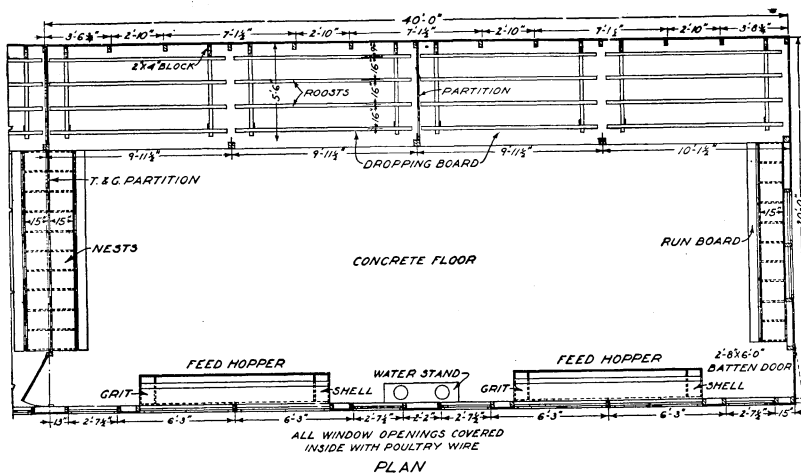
Plan of the shed-roof laying house shown in figure 16. Each pen is 20 feet deep by 40 feet wide, and has a capacity for from 200 to 225 hens.
